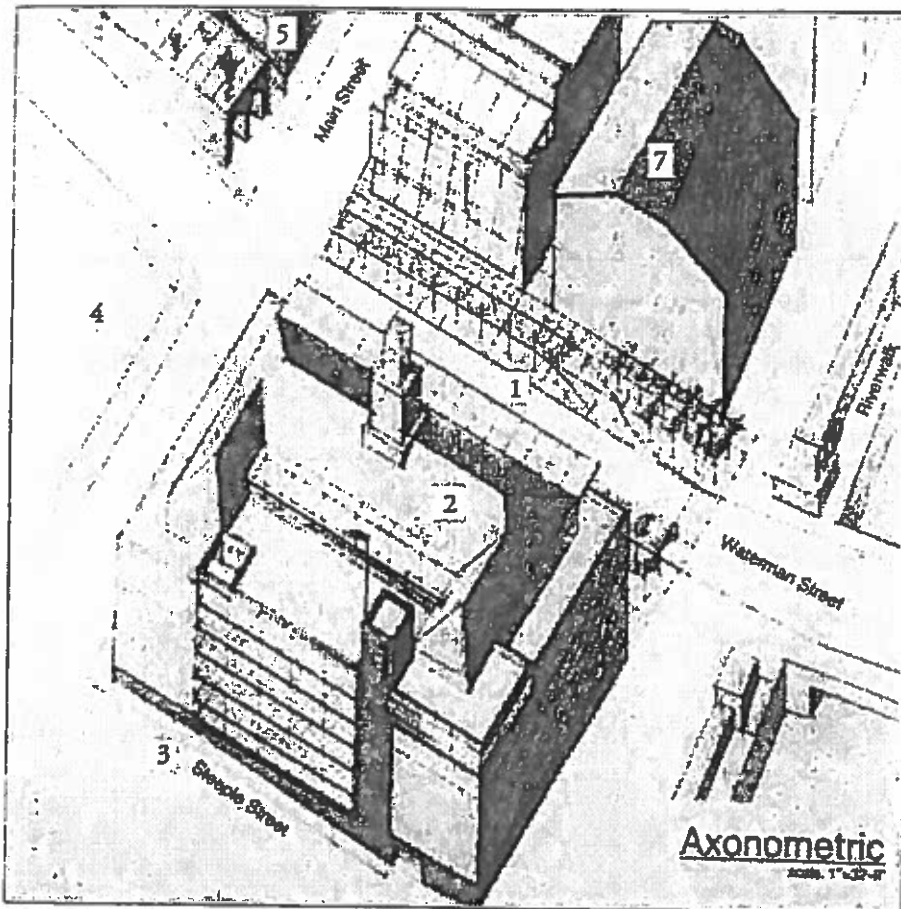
Conceptual sketch of modifications to the Washington Place & Steeple Street corridor
